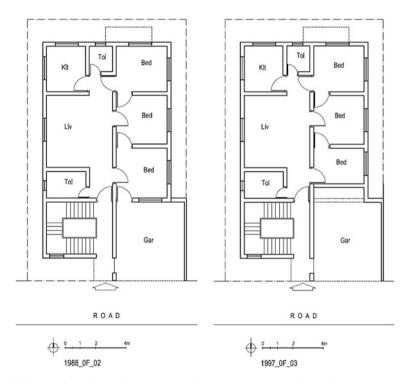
One-off solutions often happen. At first the garage served for the first car. When a new model was bought, there was not sufficient space there. Since it was brick foundation building, the structural wall could not be shifted. As an extempore solution, part of the wall was demolished just to accommodate the rear part of the car. At sill level, the space was still usable by the tenant at ground floor. *Source* Author
